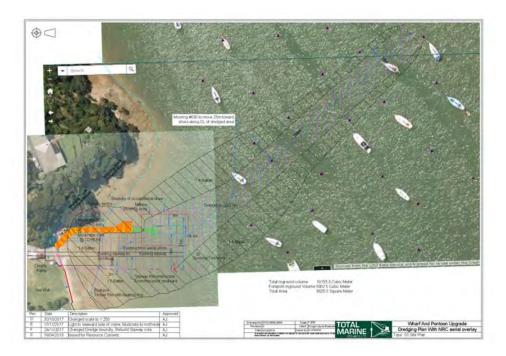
Dredging Area, Adjoining Mooring Field and Area of Reconstructed Jetty Facility
